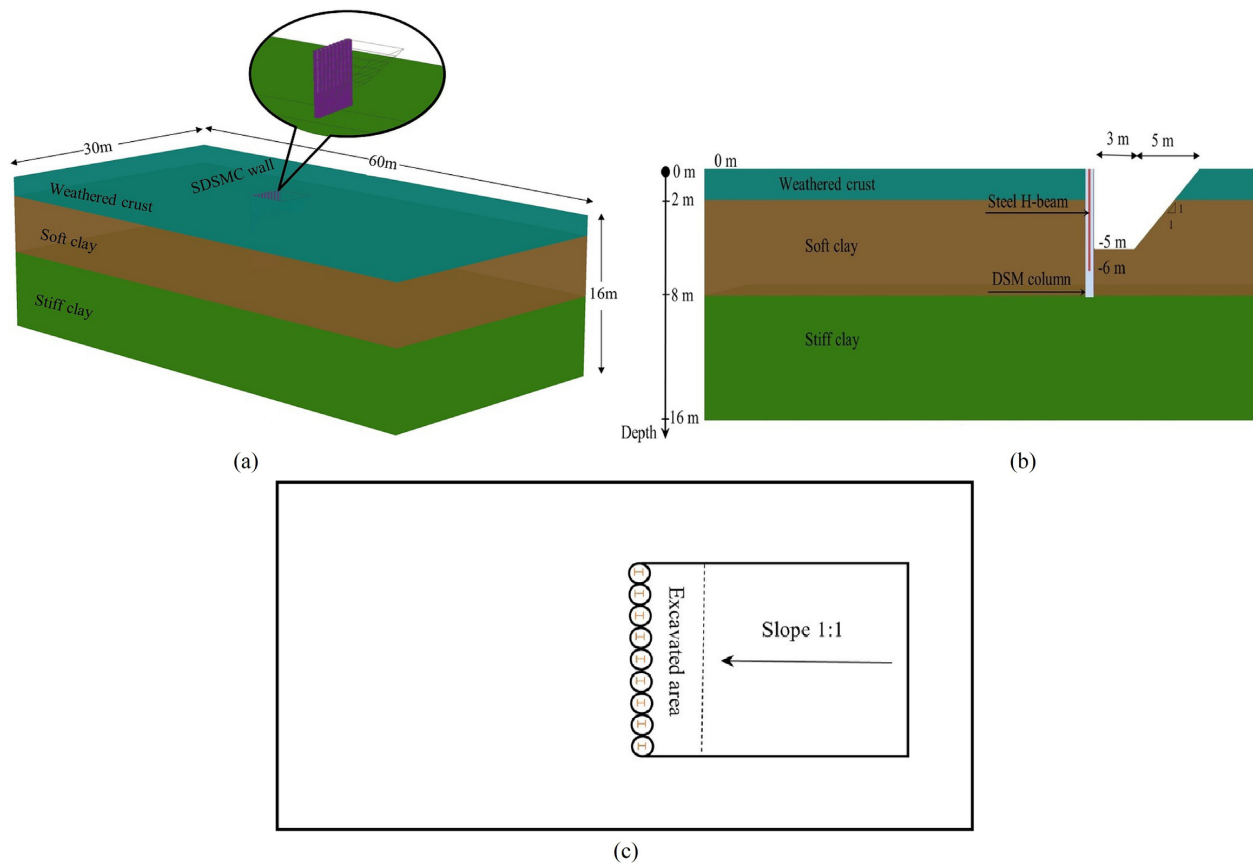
Model geometry: (a) 3D view of the soil profile and SDSMC wall; (b) cross-sectional view of the soil profile, steel H-column, and DSM column; (c) Plan view.
